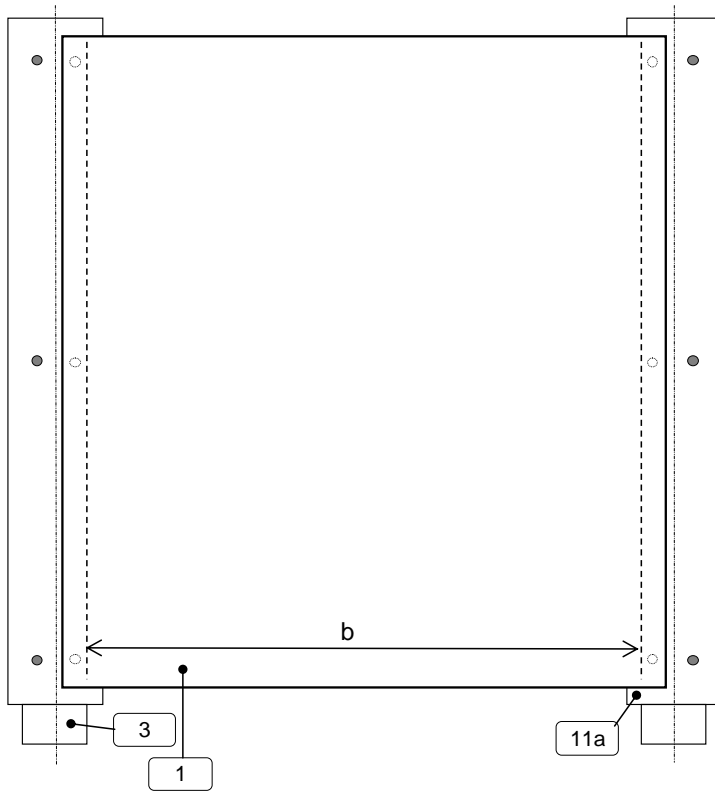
Fixing locations of Rockpanel strips for a wooden subframe
